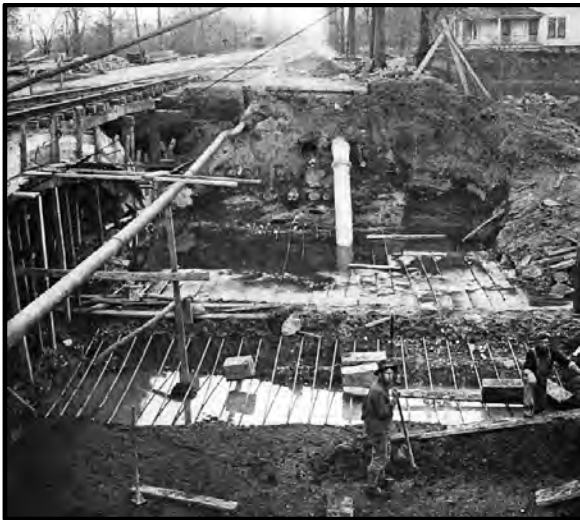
Laying streambed pavement, East Washington Street Bridge, Indianapolis, before 1909 (National Bridge Company 1908:136).
